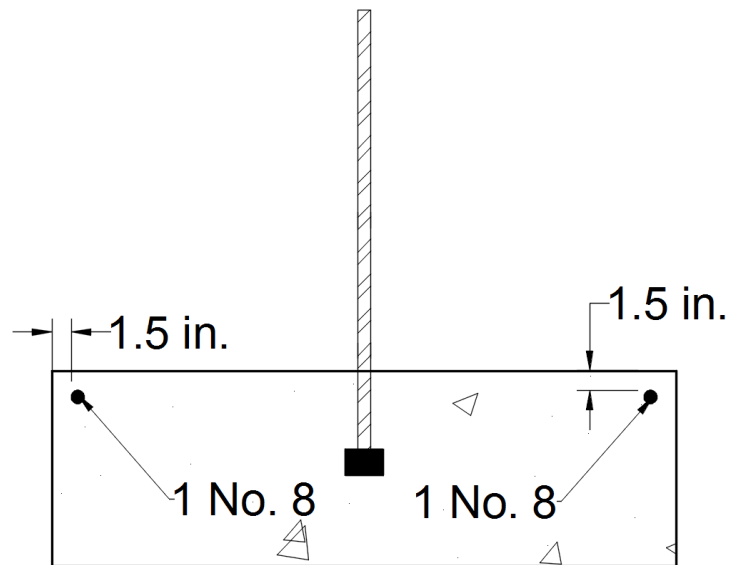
End view of shallow embedment specimen with 2 No. 8 bars as flexural reinforcement.
